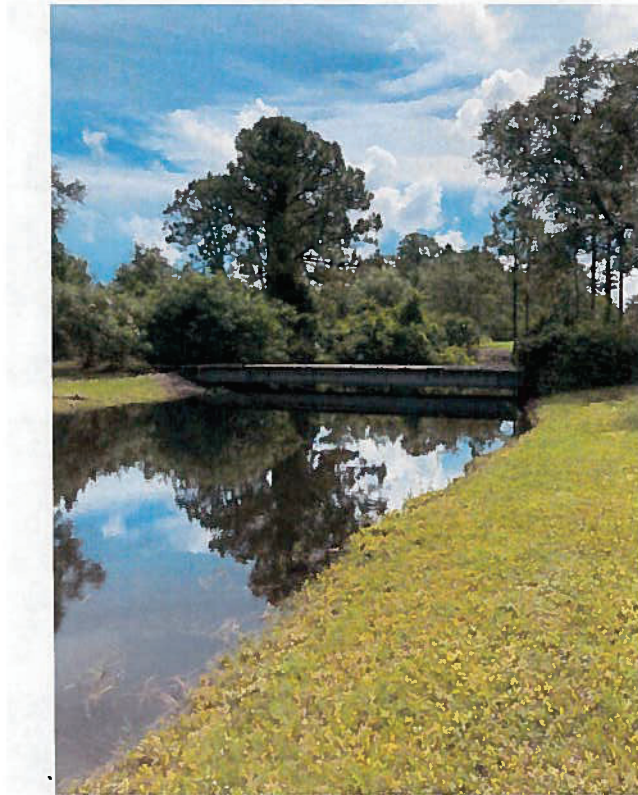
Looking east at canal and pedestrian bridge on north side of Innovation Drive
